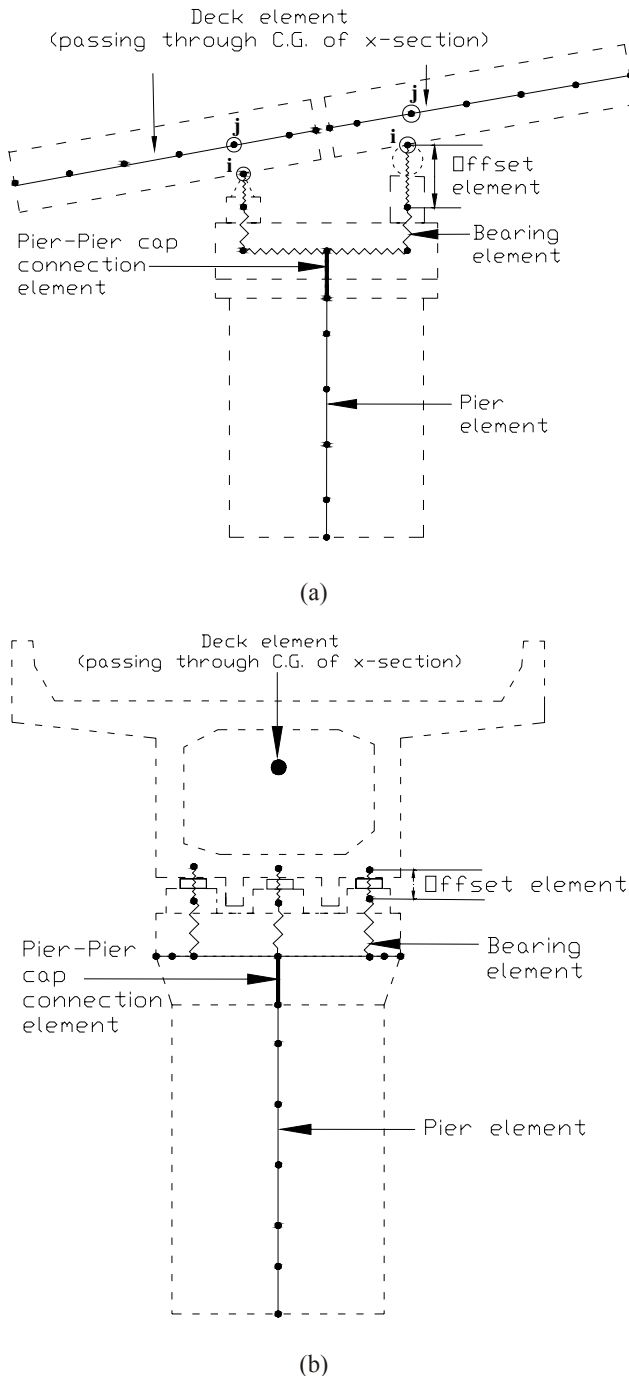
Improved stick model expansion joint (a) longitudinal section (b) cross-section
